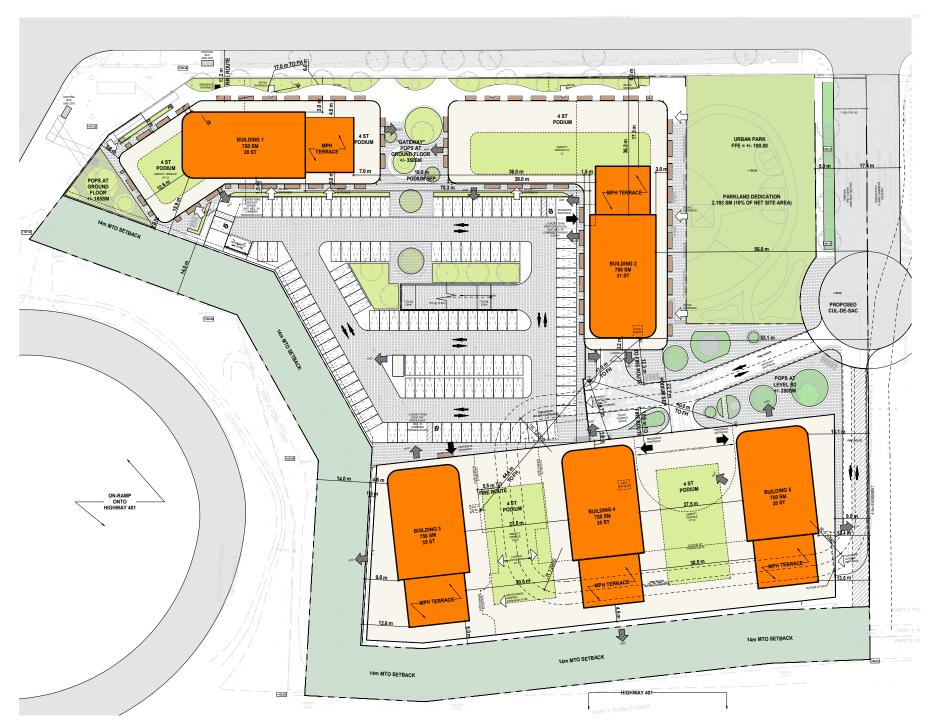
SITE PLAN (BDP. QUADRANGLE ARCHITECTS LTD.)
